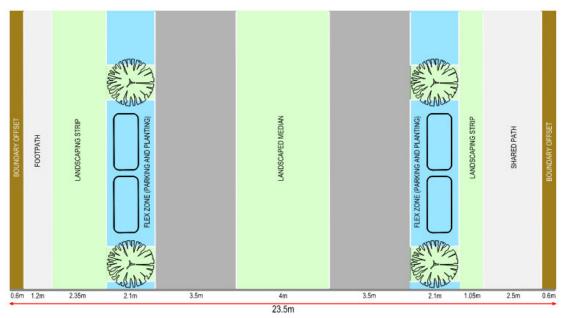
A – Section 4 green link local road Figure 2-17A: Section 4 Local Green Link
